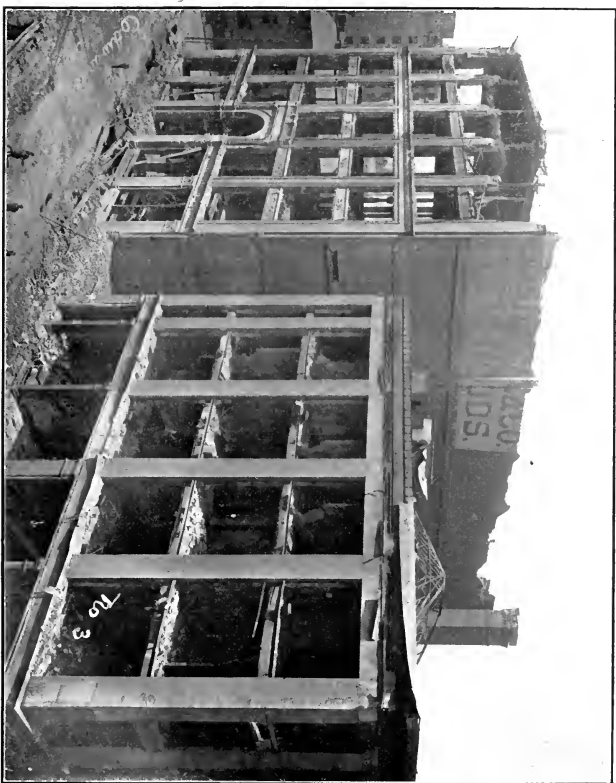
Exterior View of Horne Store and Office Buildings, Pittsburgh, after Fire.
